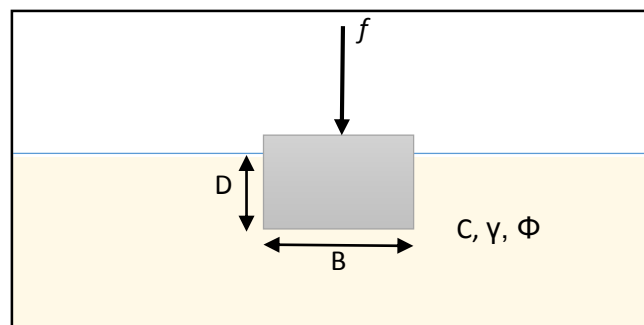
Footing Resting on a Soil (c, ϕ).
